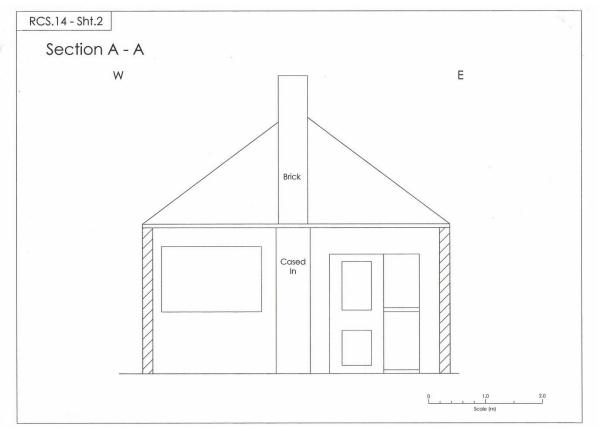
Rosehill Country Store: Section through north end of building (See Fig. 4 for location)
